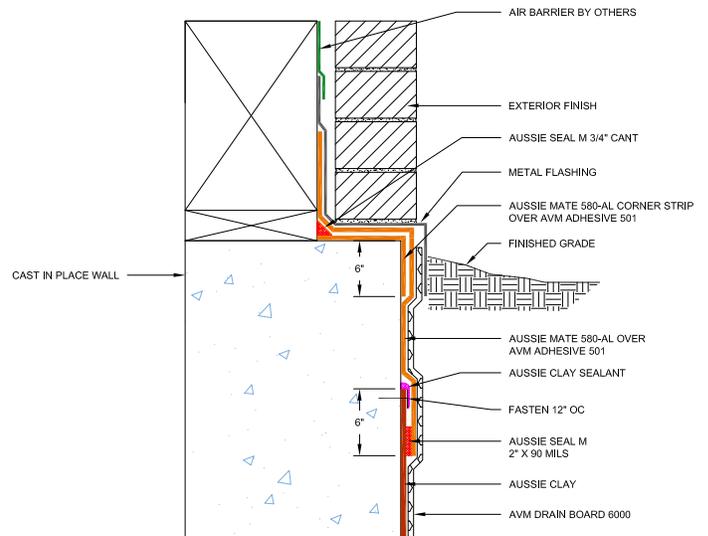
BRICK LEDGE TERMINATION WITH FLASHING
